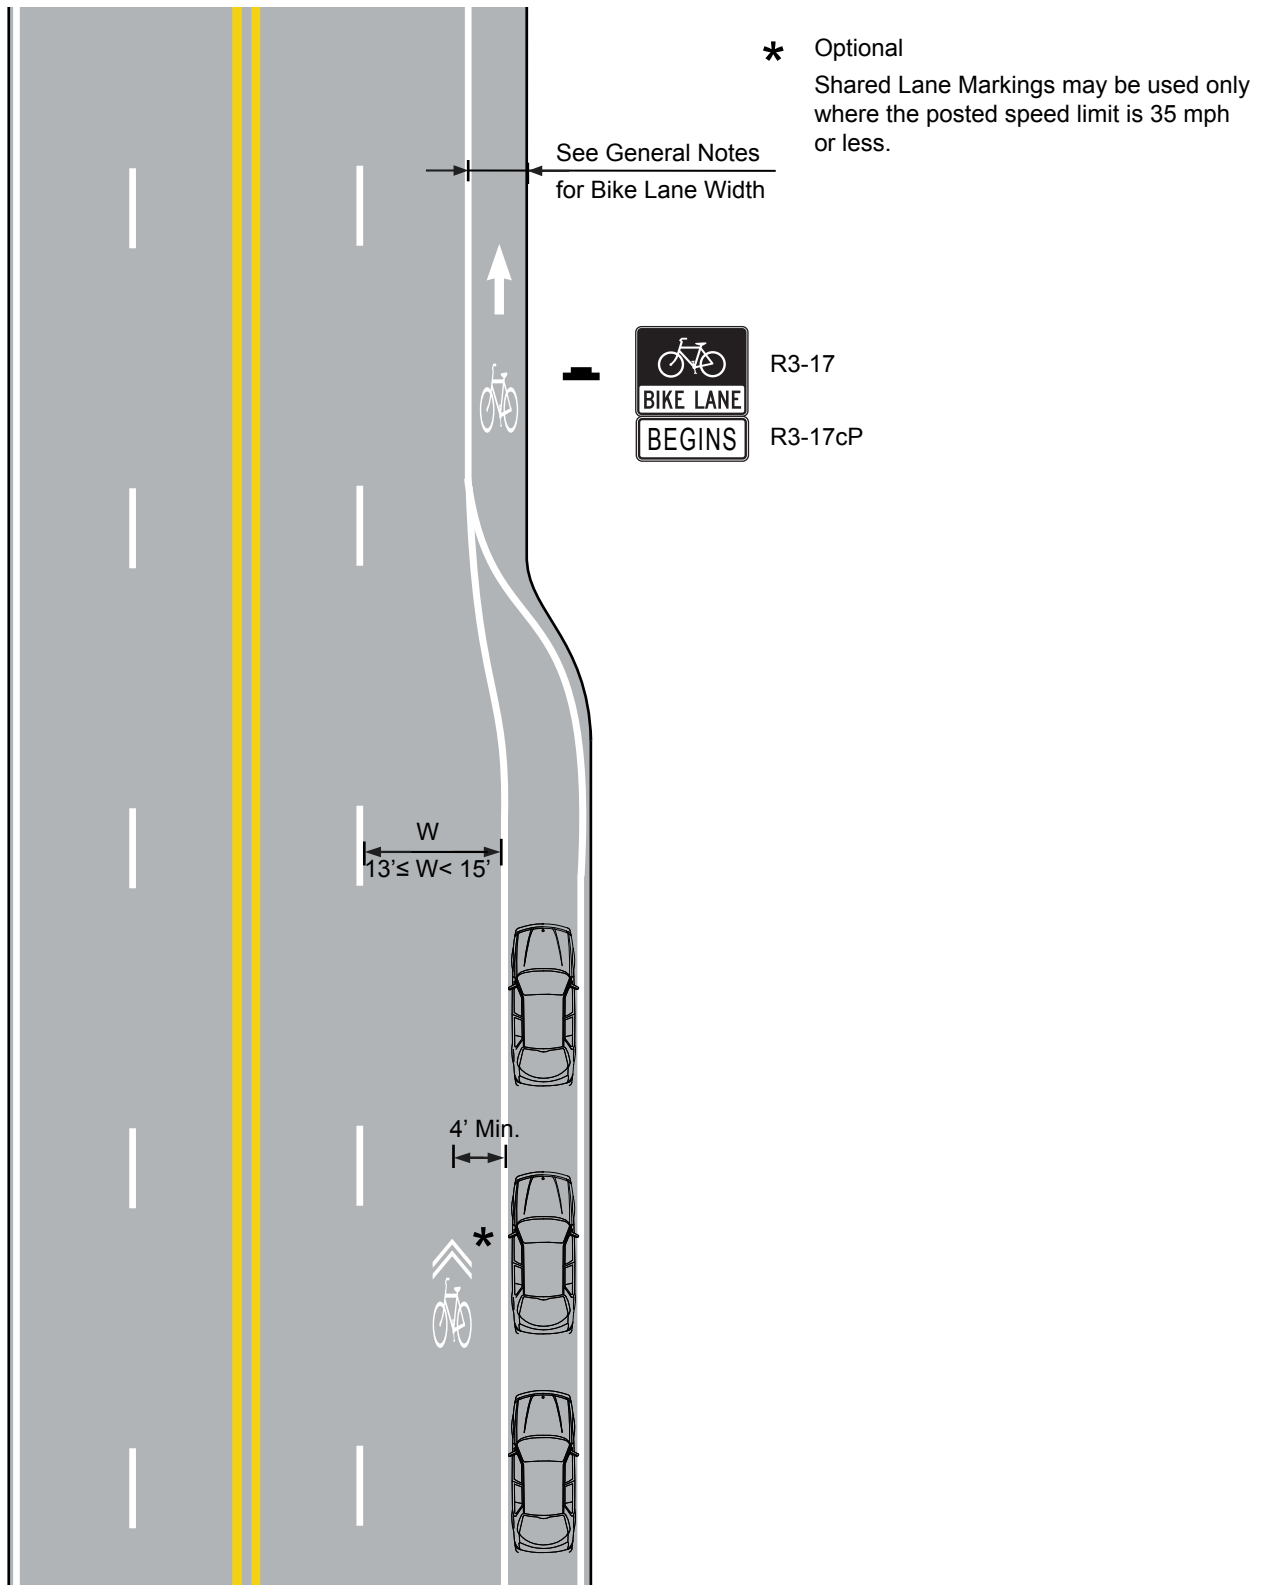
Example of Typical Transition from Shared Lane with Parking to BIKE LANE with Parking
